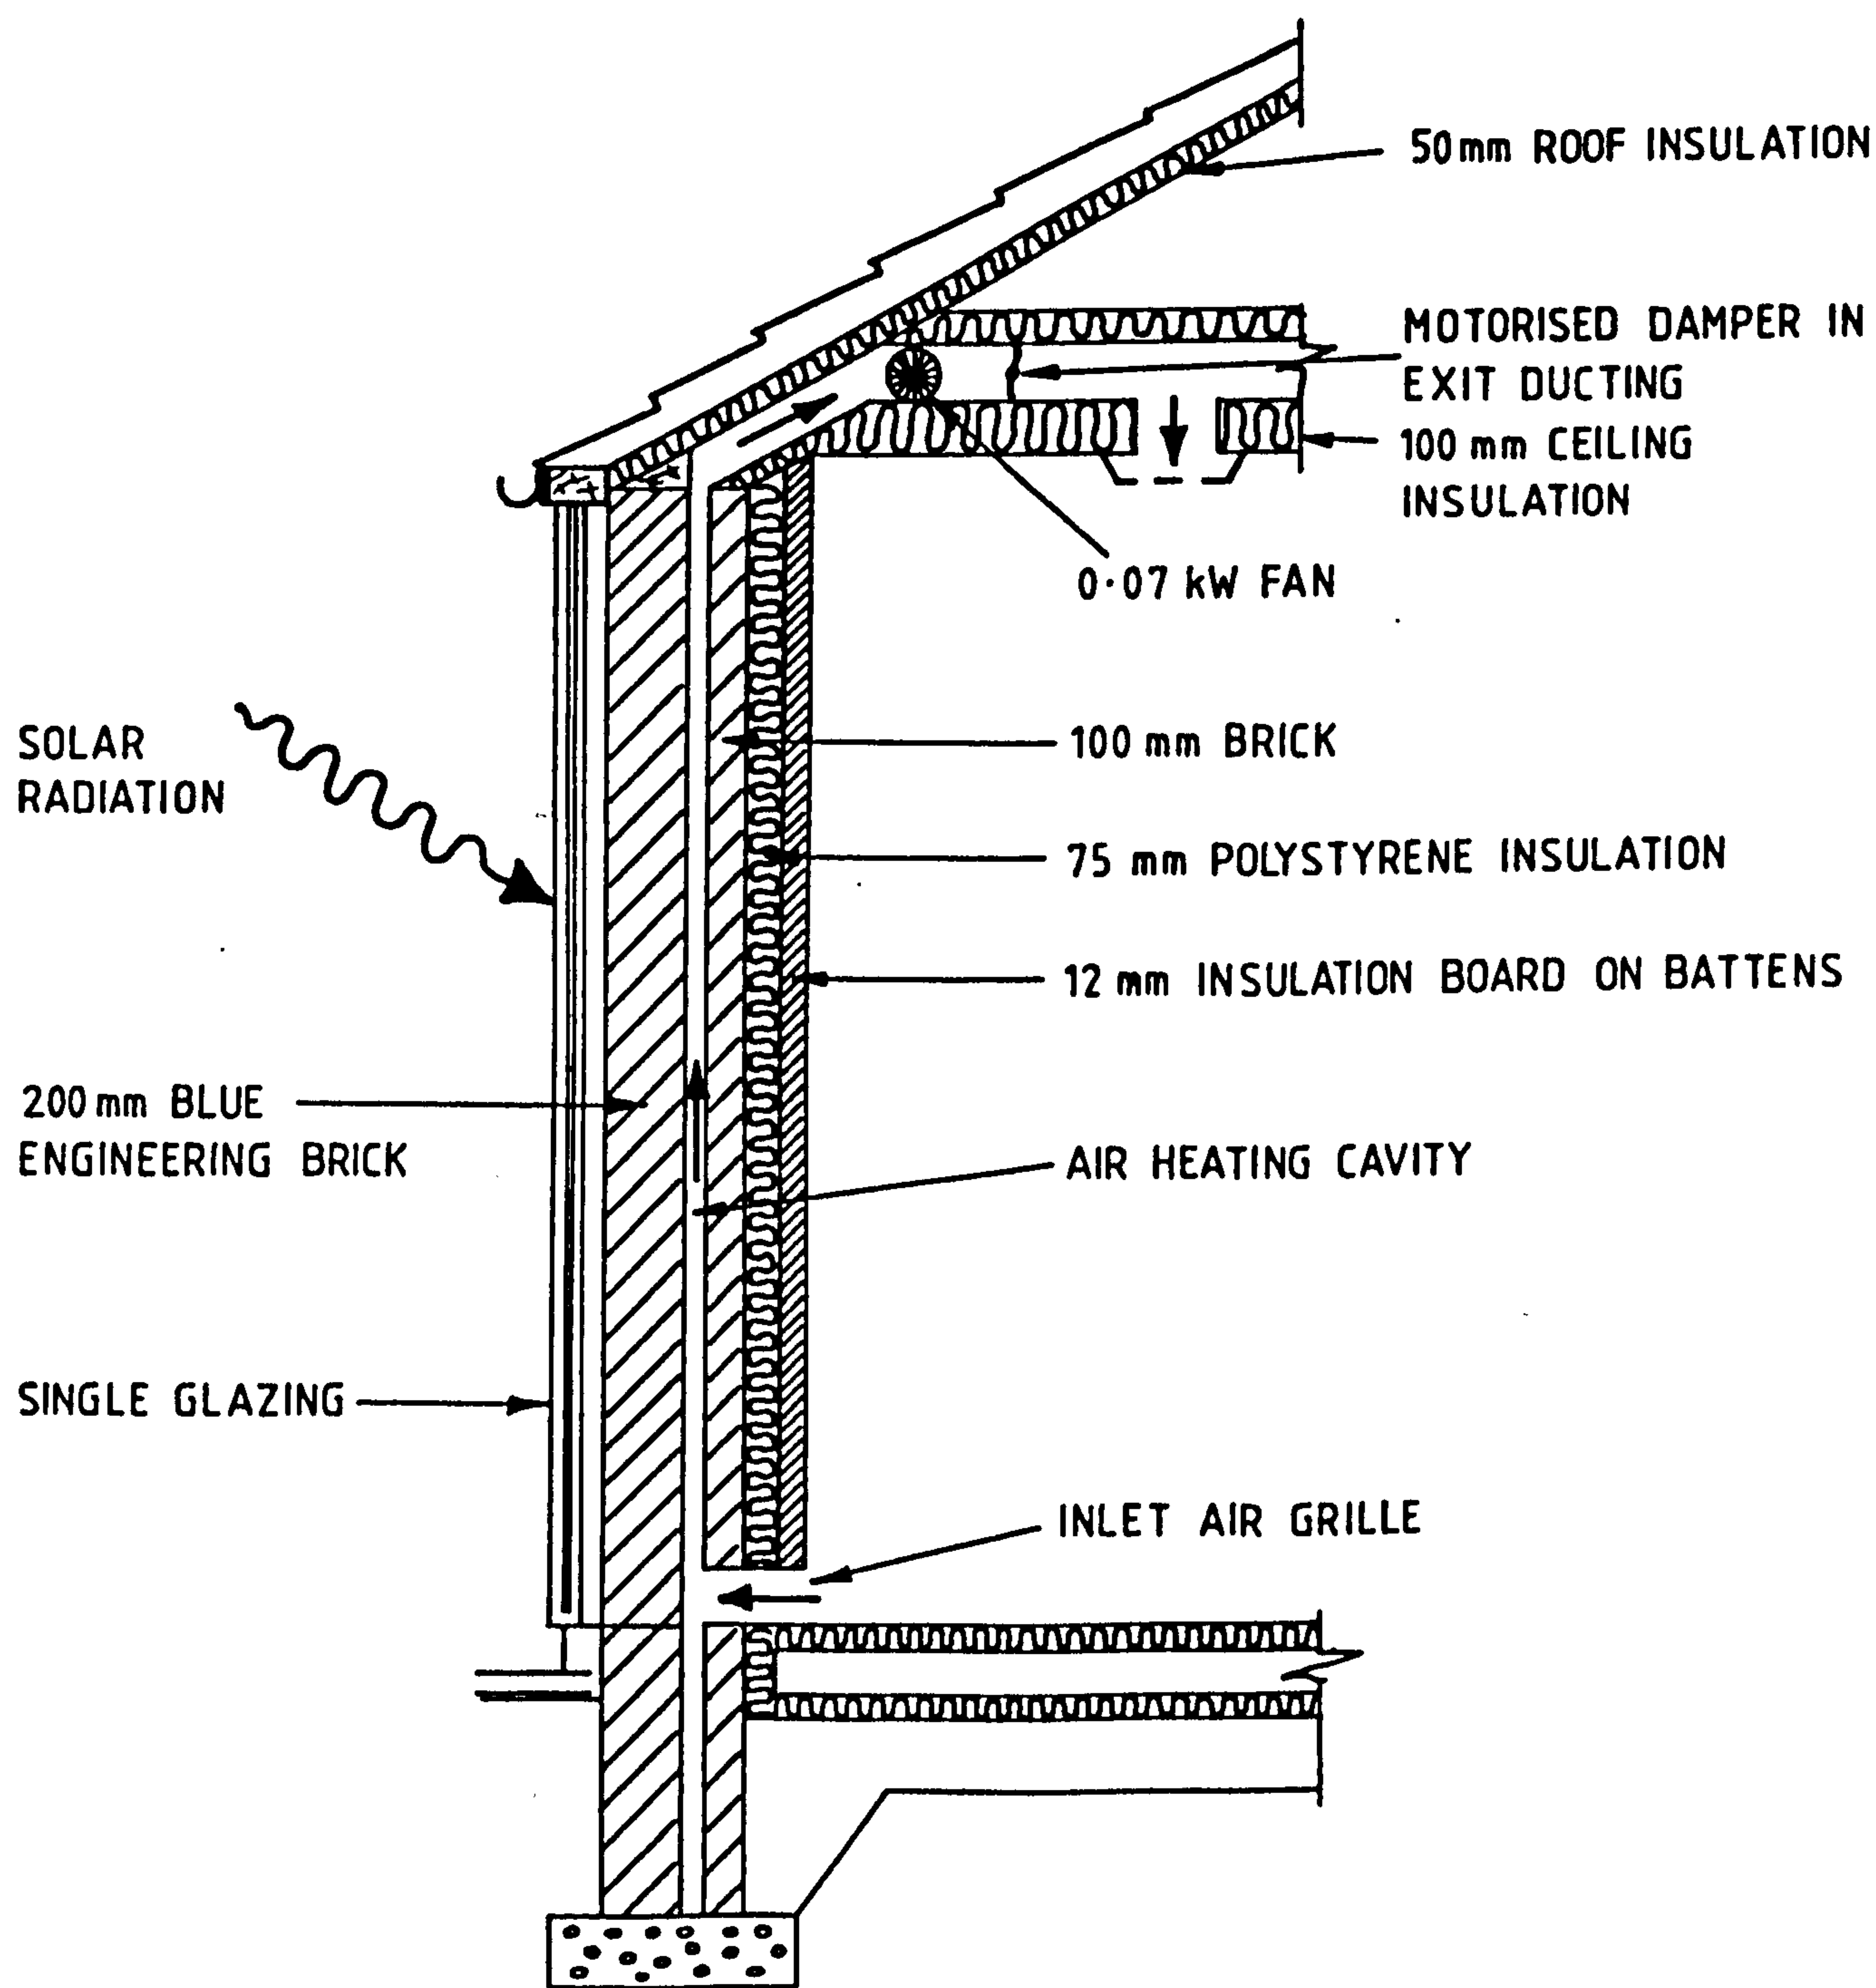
Section of solar wall at Poulton Lancelyn.
